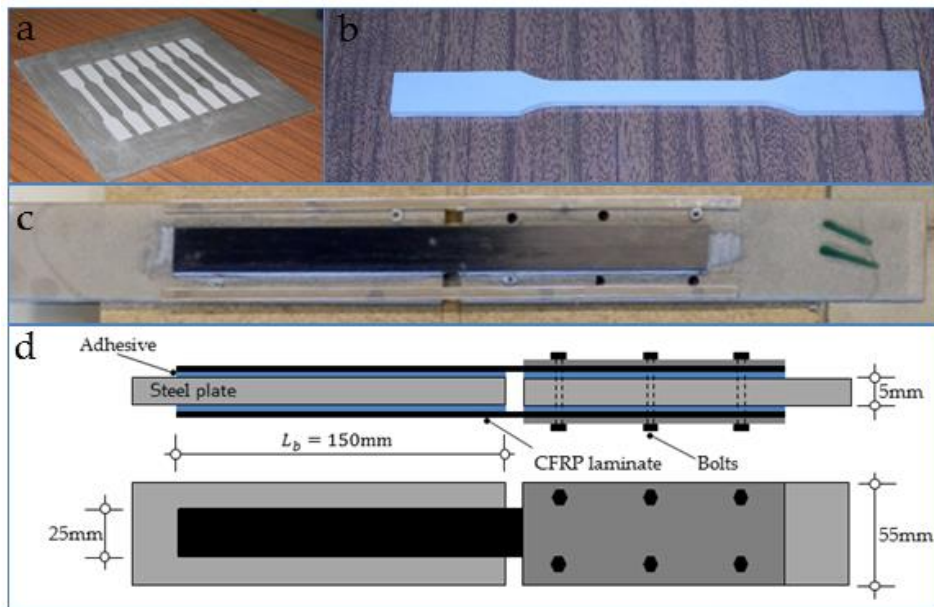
Joint specimens: (a) plate to shape adhesive coupons (b) adhesive coupon (c) and (d) CFRP-to-steel bonded joints.
